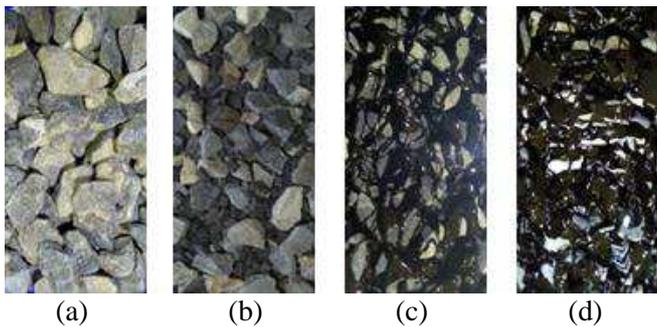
Specimens (a) ballast (specimen 1) (b) Ballast with scrap rubber (specimen 2 and 3) (c) Ballast with bitumen (specimen 4) (d) Ballast with scrap rubber and bitumen (specimen 5 and 6)
